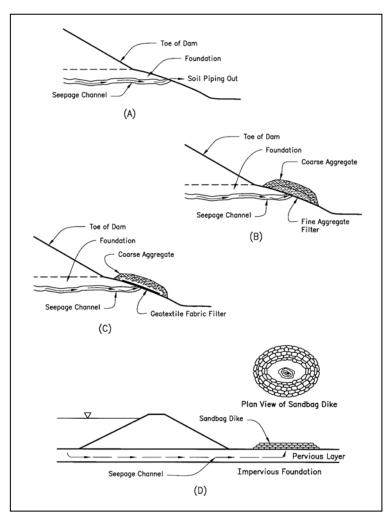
EMERGENCY MEASURES TO TEMPORARILY CONTROL PIPING BELOW DAMS
